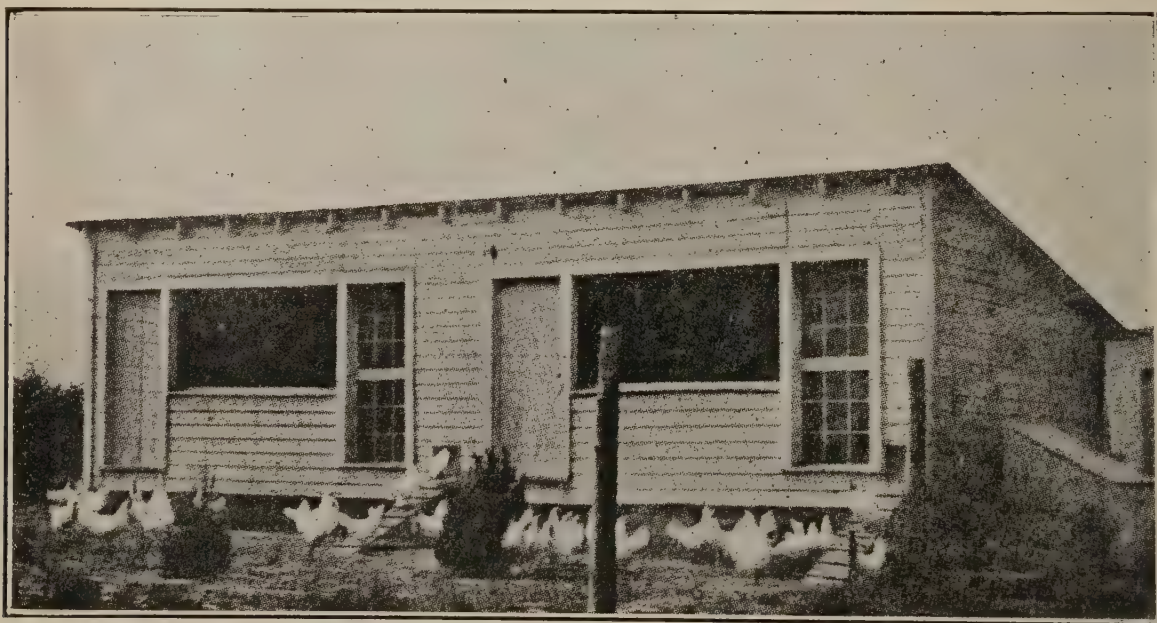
Shed-roof chicken house having good light and ventilation.
